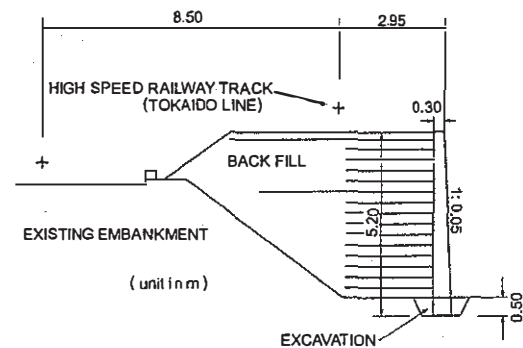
Typical cross-section of the slope of railway embankment for Tokaido Line reconstructed by the proposed geosynthetic-reinforced soil retaining wall method (RRR method), Amagasaki
